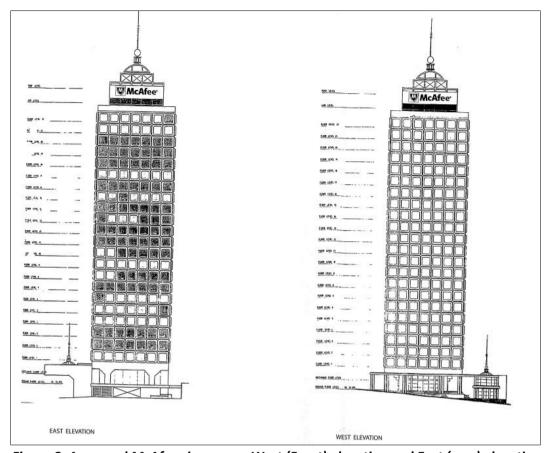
Approved McAfee signage on West (Front) elevation and East (rear) elevation
